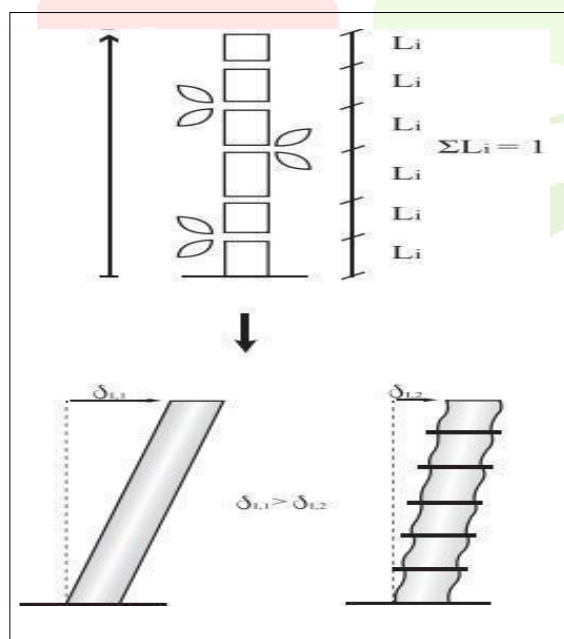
Mechanics of bamboo transferred into the design of a tall building for outrigger placement.
